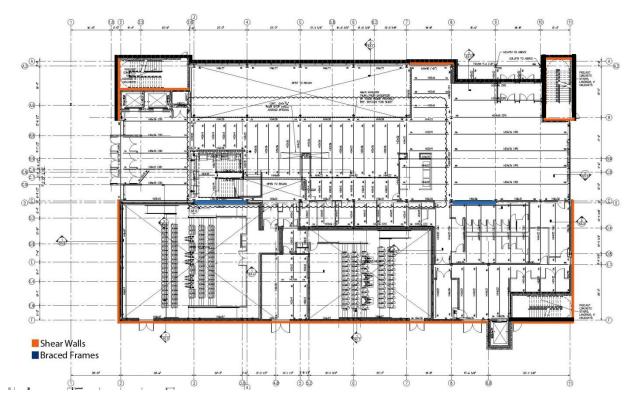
Floor plan highlighting shear walls and braced frames, contributing to the lateral system.
